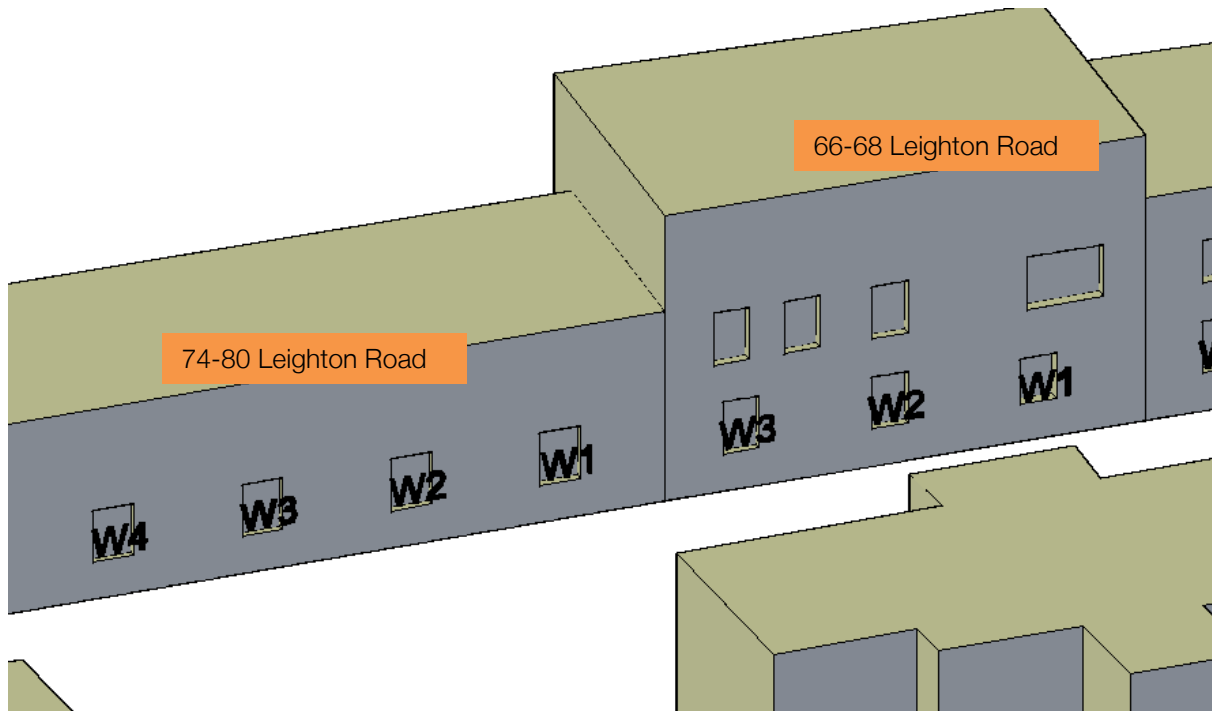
Windows assessed for daylight – 66-68 and 74-80 Leighton Road
